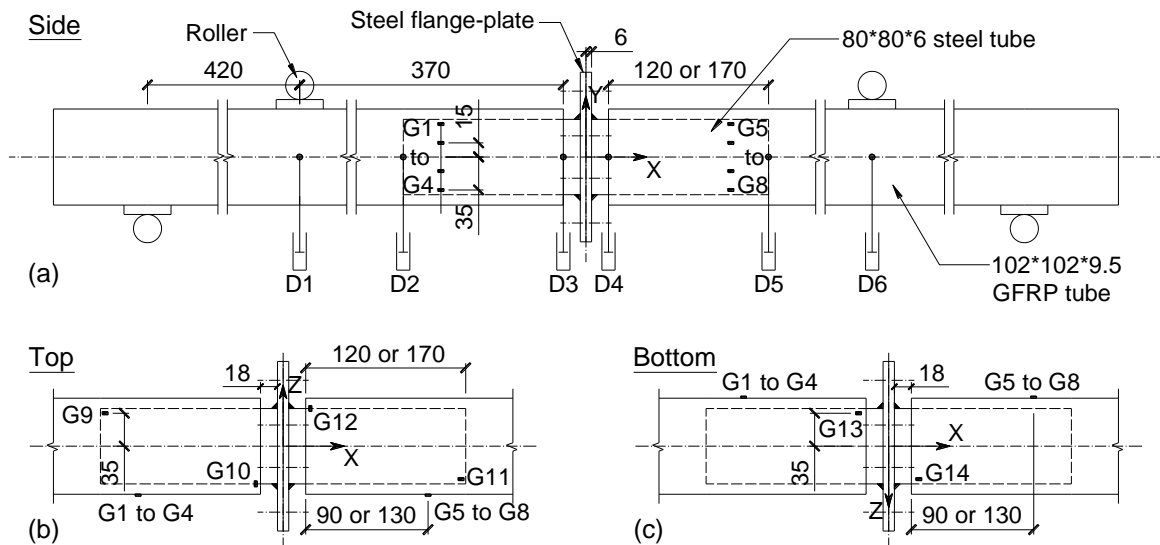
Dimensions of specimens and instrumentation: (a) side view; (b) top view; and (c) bottom view (all dimensions in mm).
